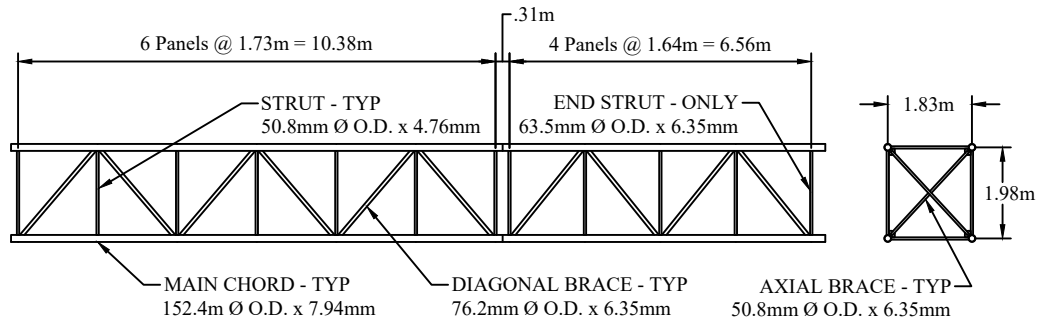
Plan view of the truss with dimensions and nomenclature
